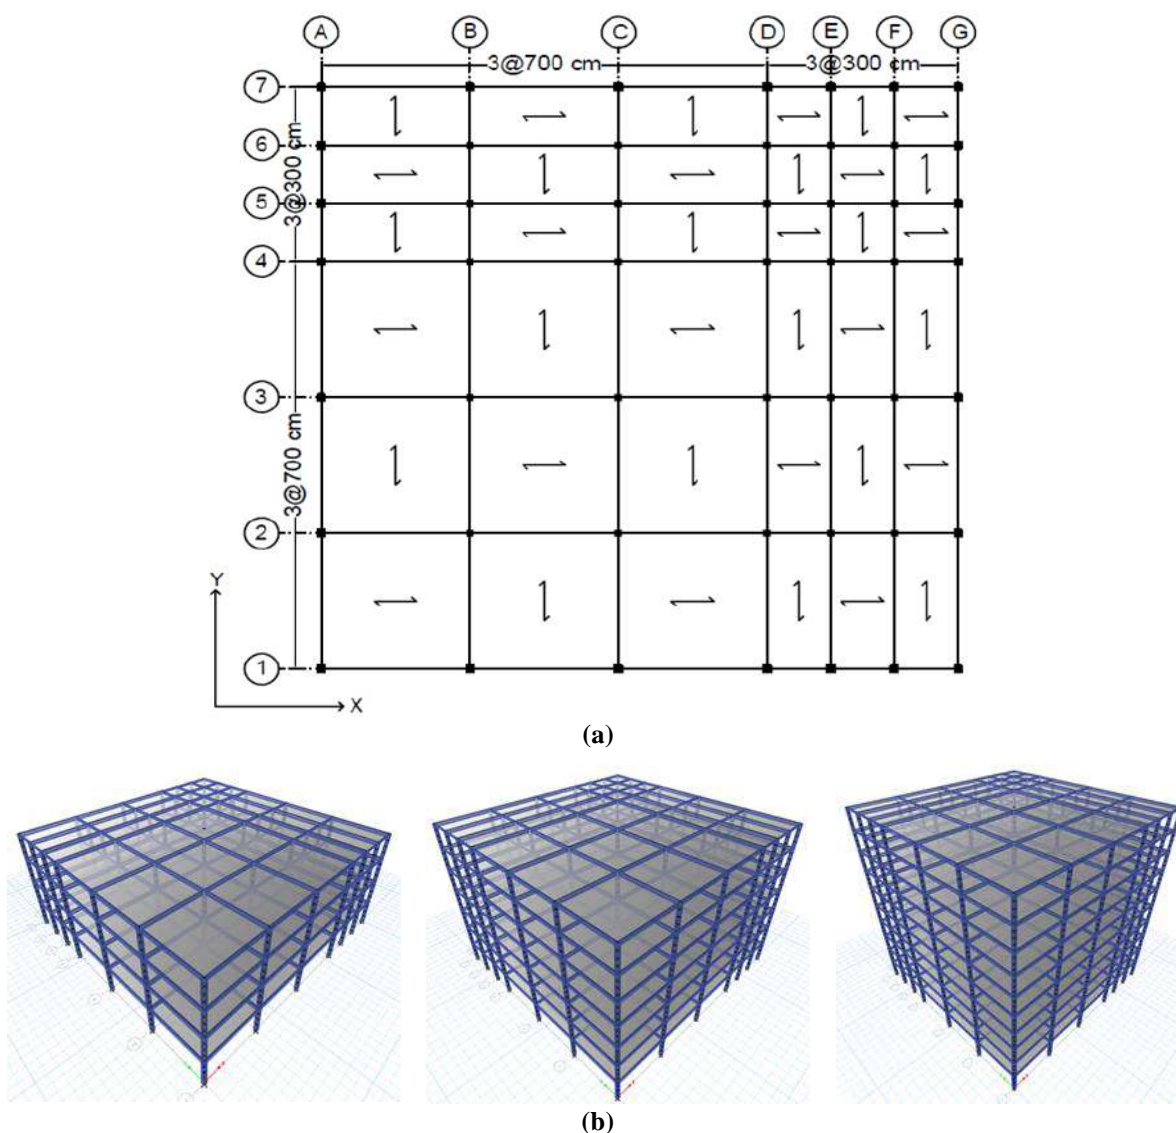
The studied buildings: a) The common story plan; and b) The perspective
